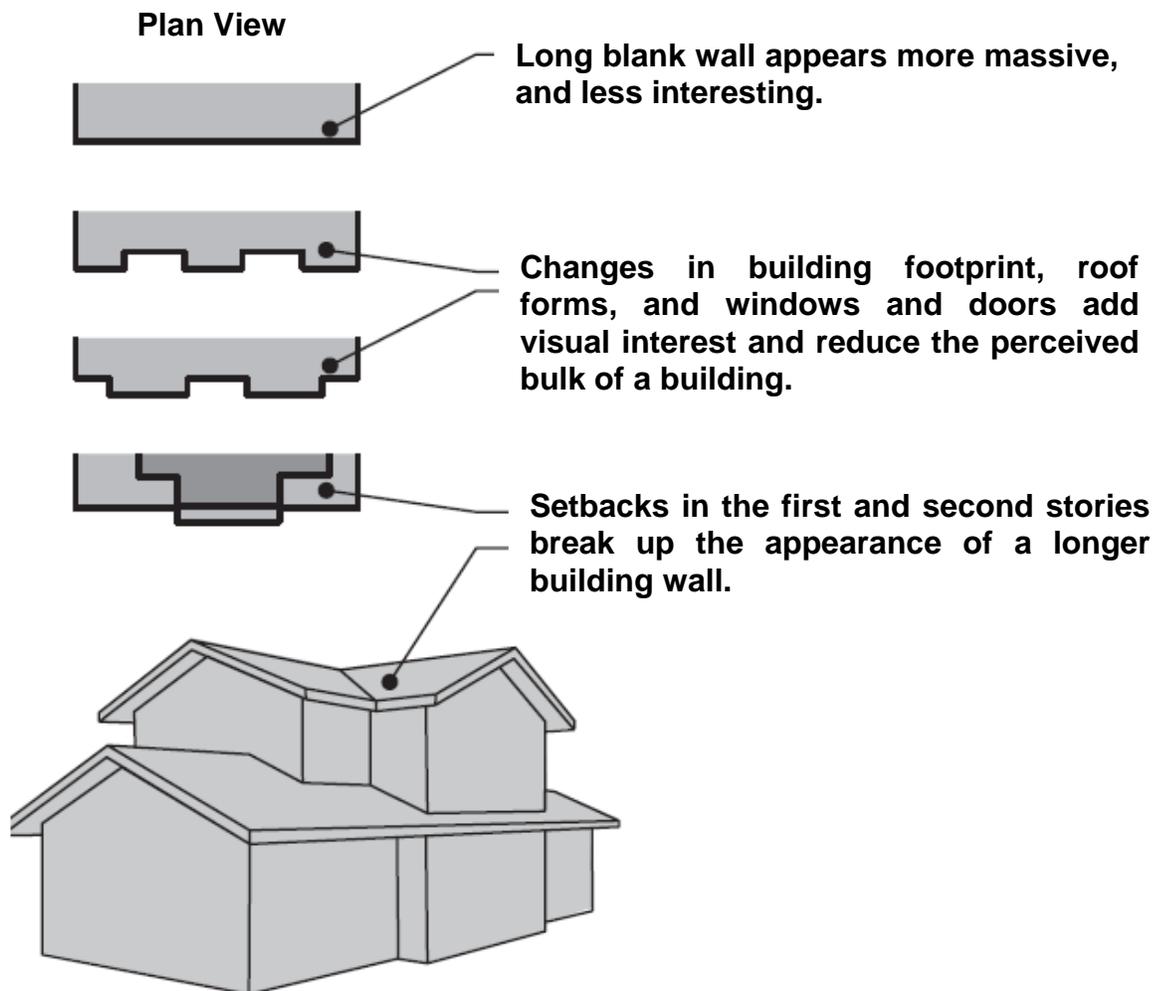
The appearance of the home shown above is visually interesting due to its articulated building walls and roof forms. Substantial window framing, textured exterior walls, divided light windows, and material variation (i.e., a stone base with horizontal siding) could be used to further complement the design of this home.
